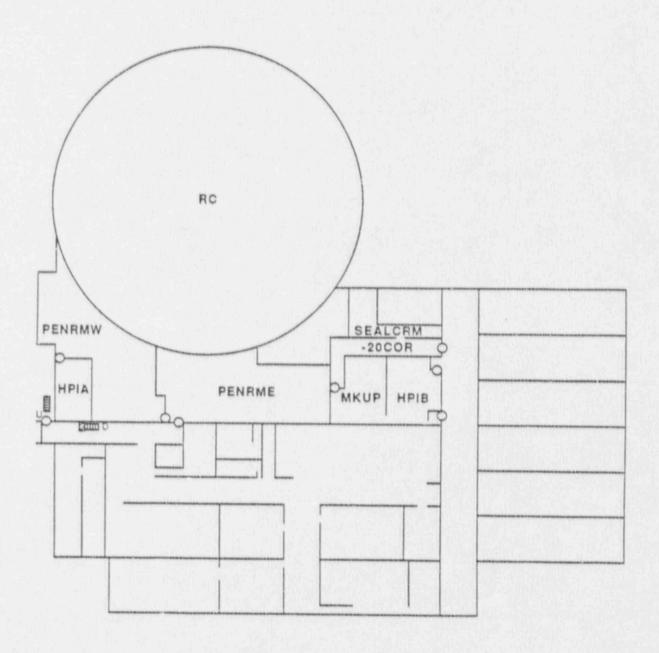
Rancho Seco Containment and Auxiliary Buildings, Elevation -20 ft.
